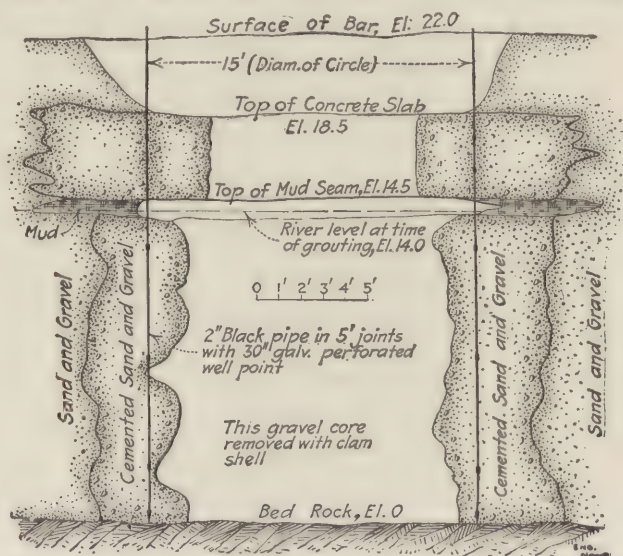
Typical Cross-section of Concrete Cylinder Formed by the Circle of Grouping Pipes.
